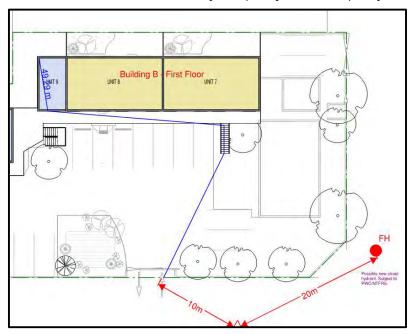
Building B - Indicative Hydrant Coverage from Proposed New FH. Subject to PWC.
